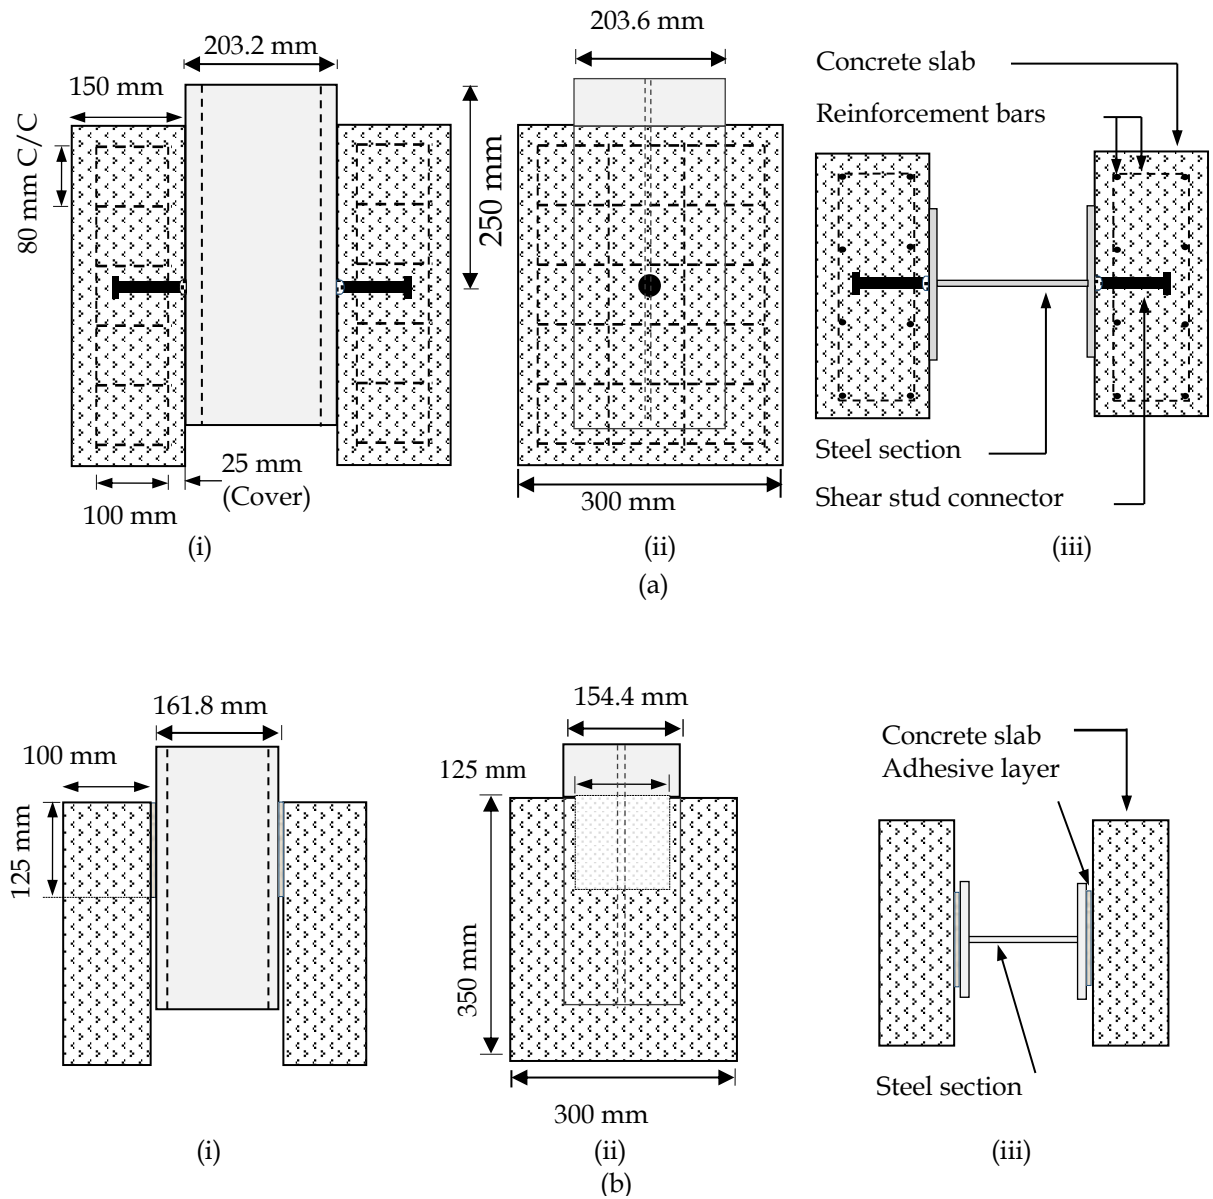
Vertical Push-out test specimen; (a) headed stud connected steel-concrete composite specimen; (i) front view, (ii) side view and (iii) top view, and (b) adhesive bonded steel-concrete composite specimen; (i) front view, (ii) side view and (iii) top view
